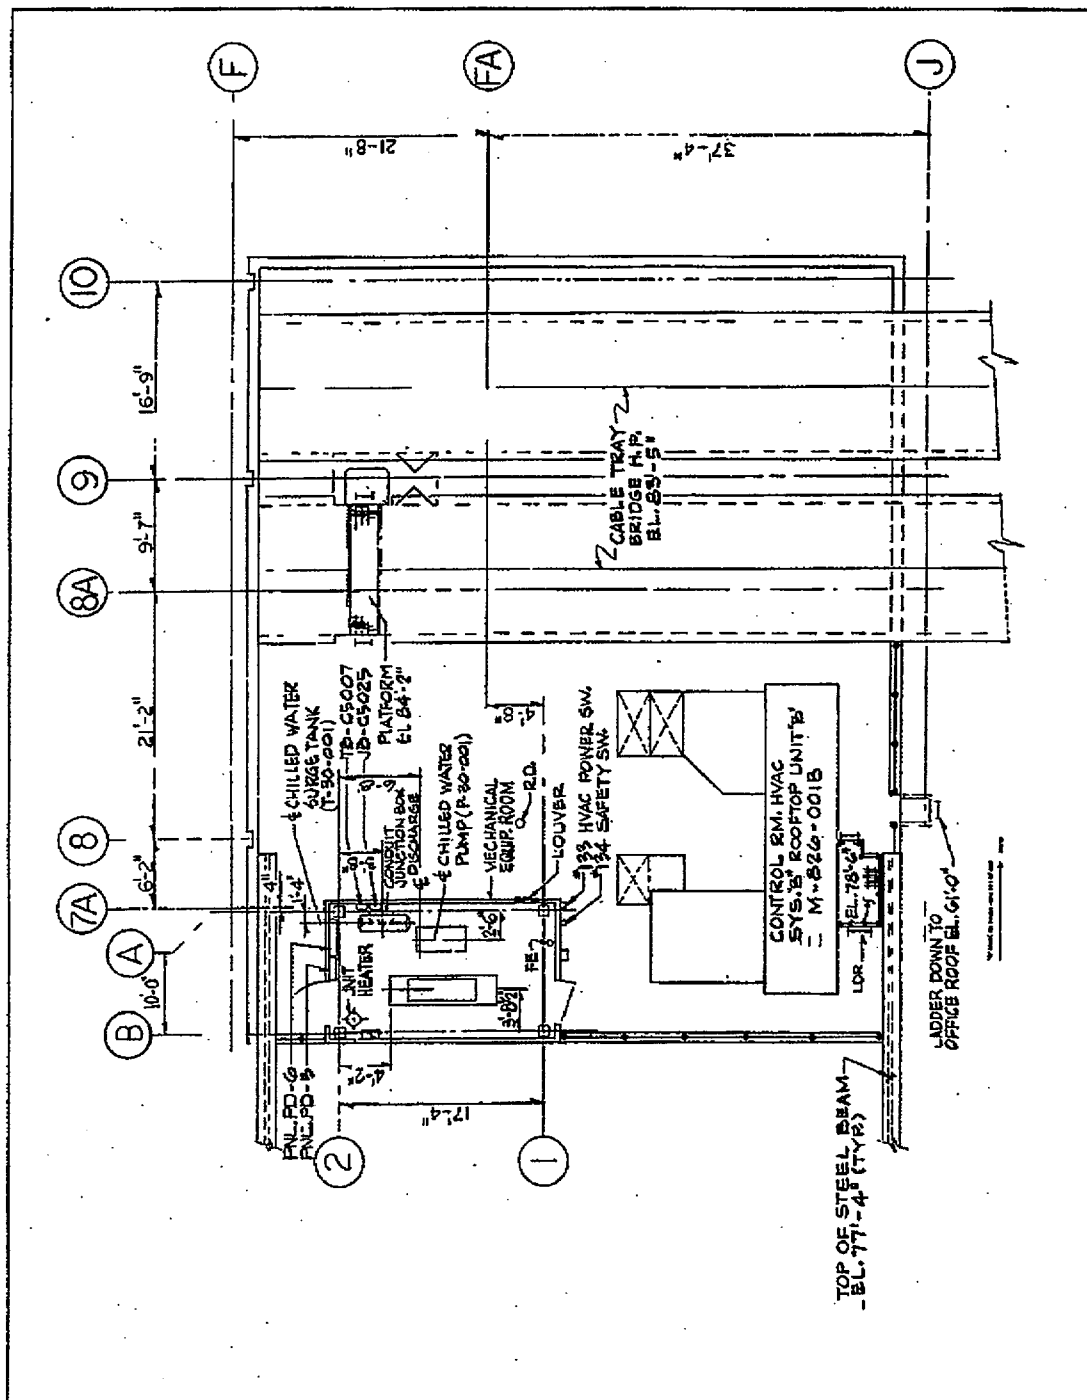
"B" HVAC Plan layout (see dwg 151-02-009)
